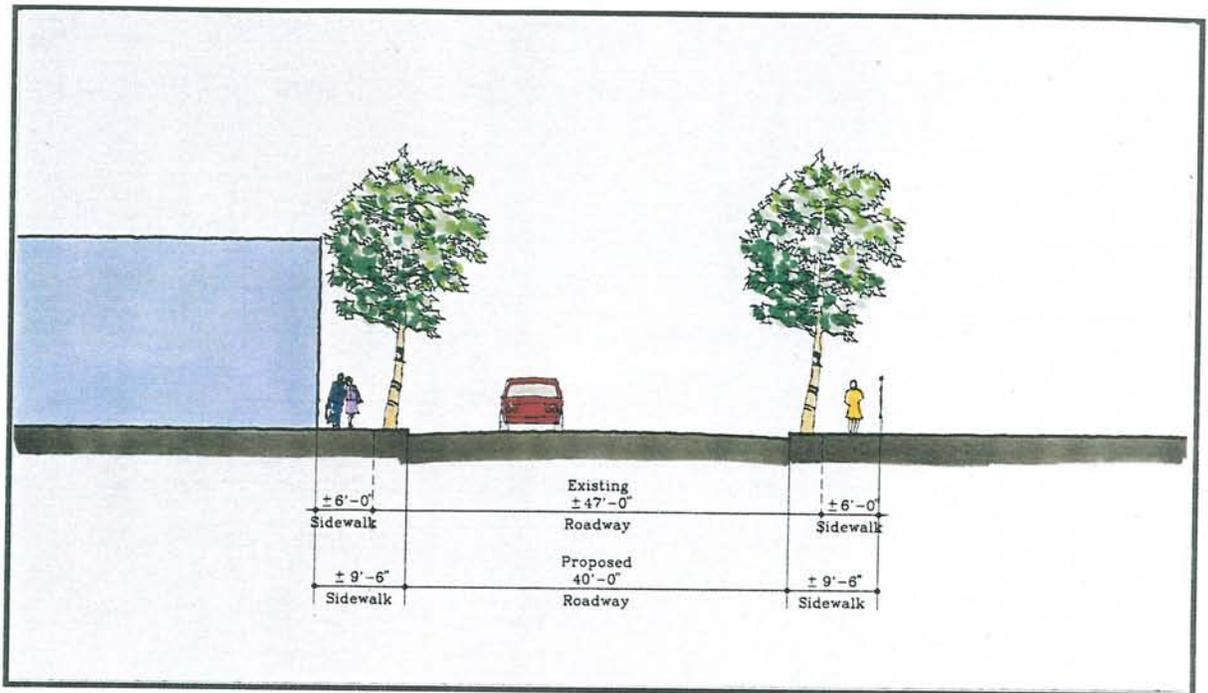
Cross section at Rogers Street - Existing and Proposed Sidewalk Widths
